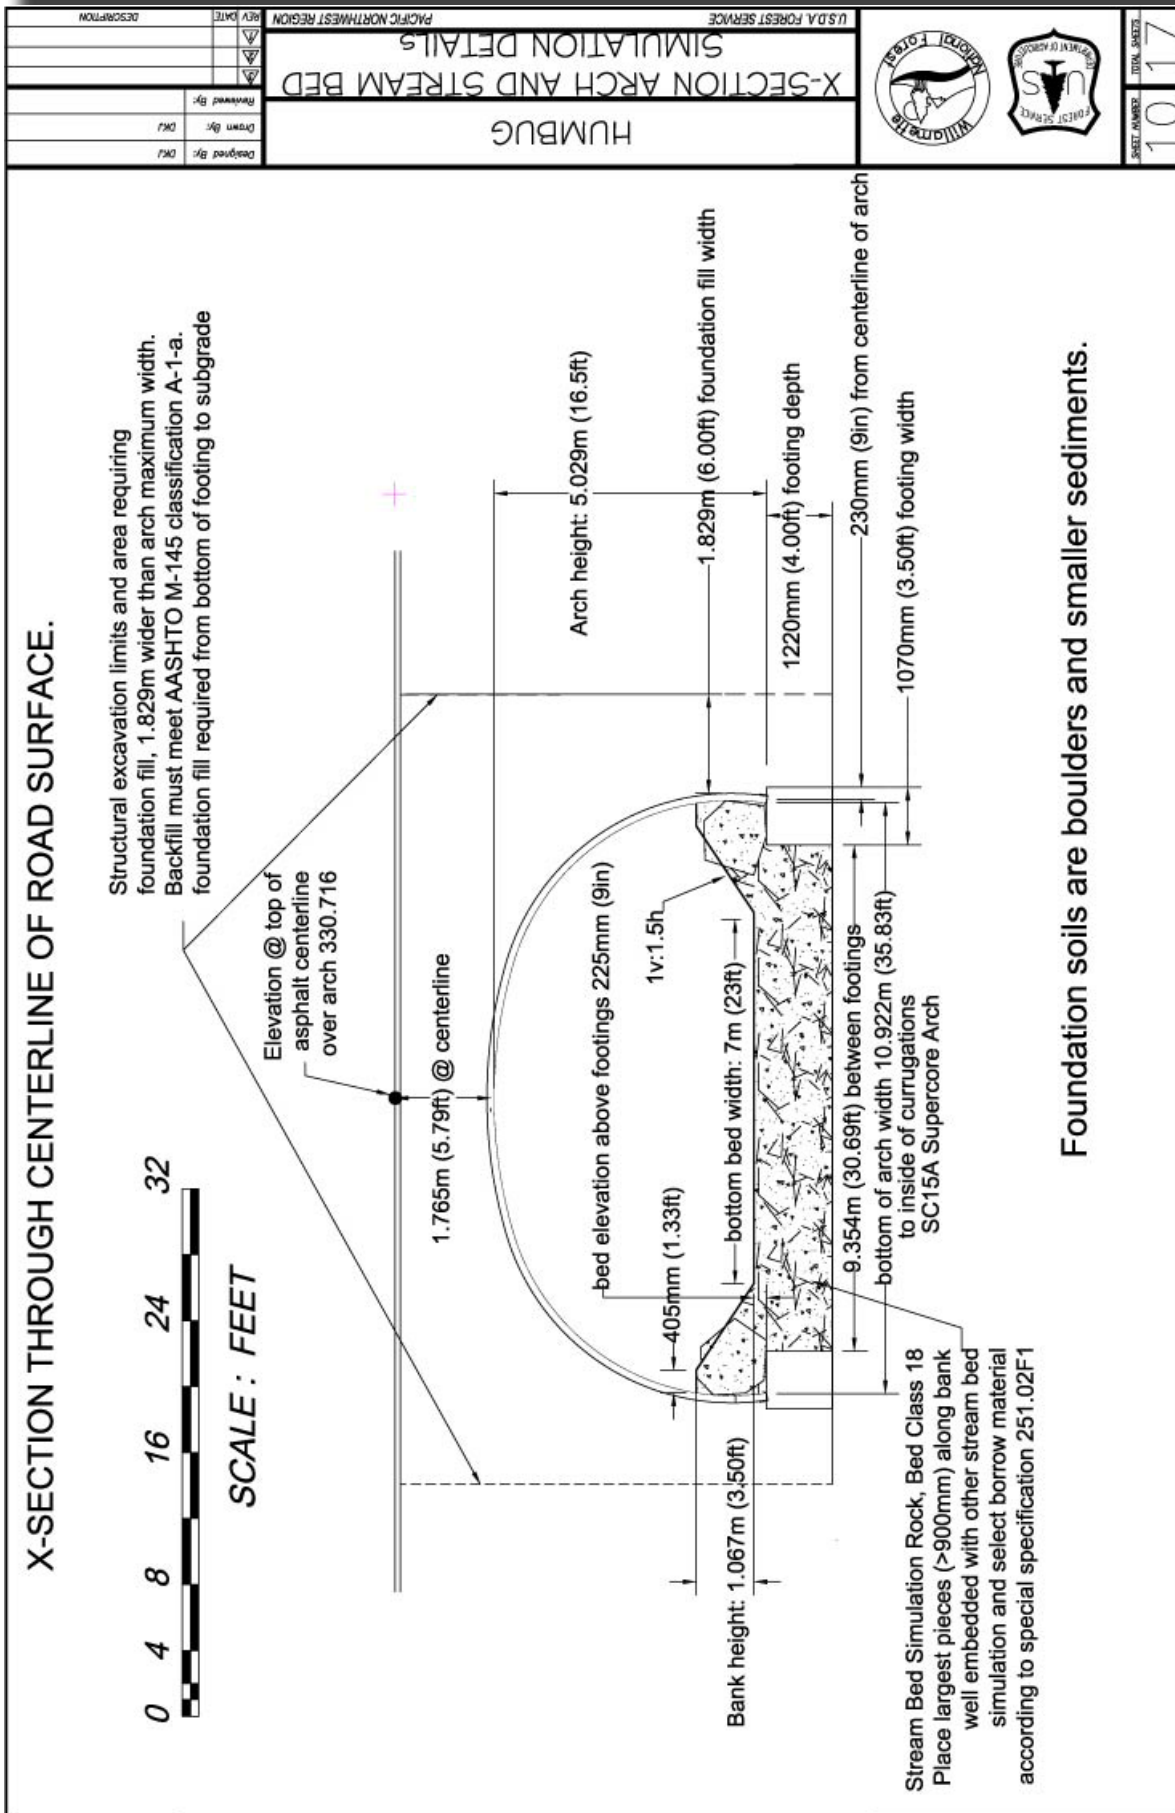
Humburg West Sheet 10 - Cross Section of Arch and Stream-Simulation Bed Details.
